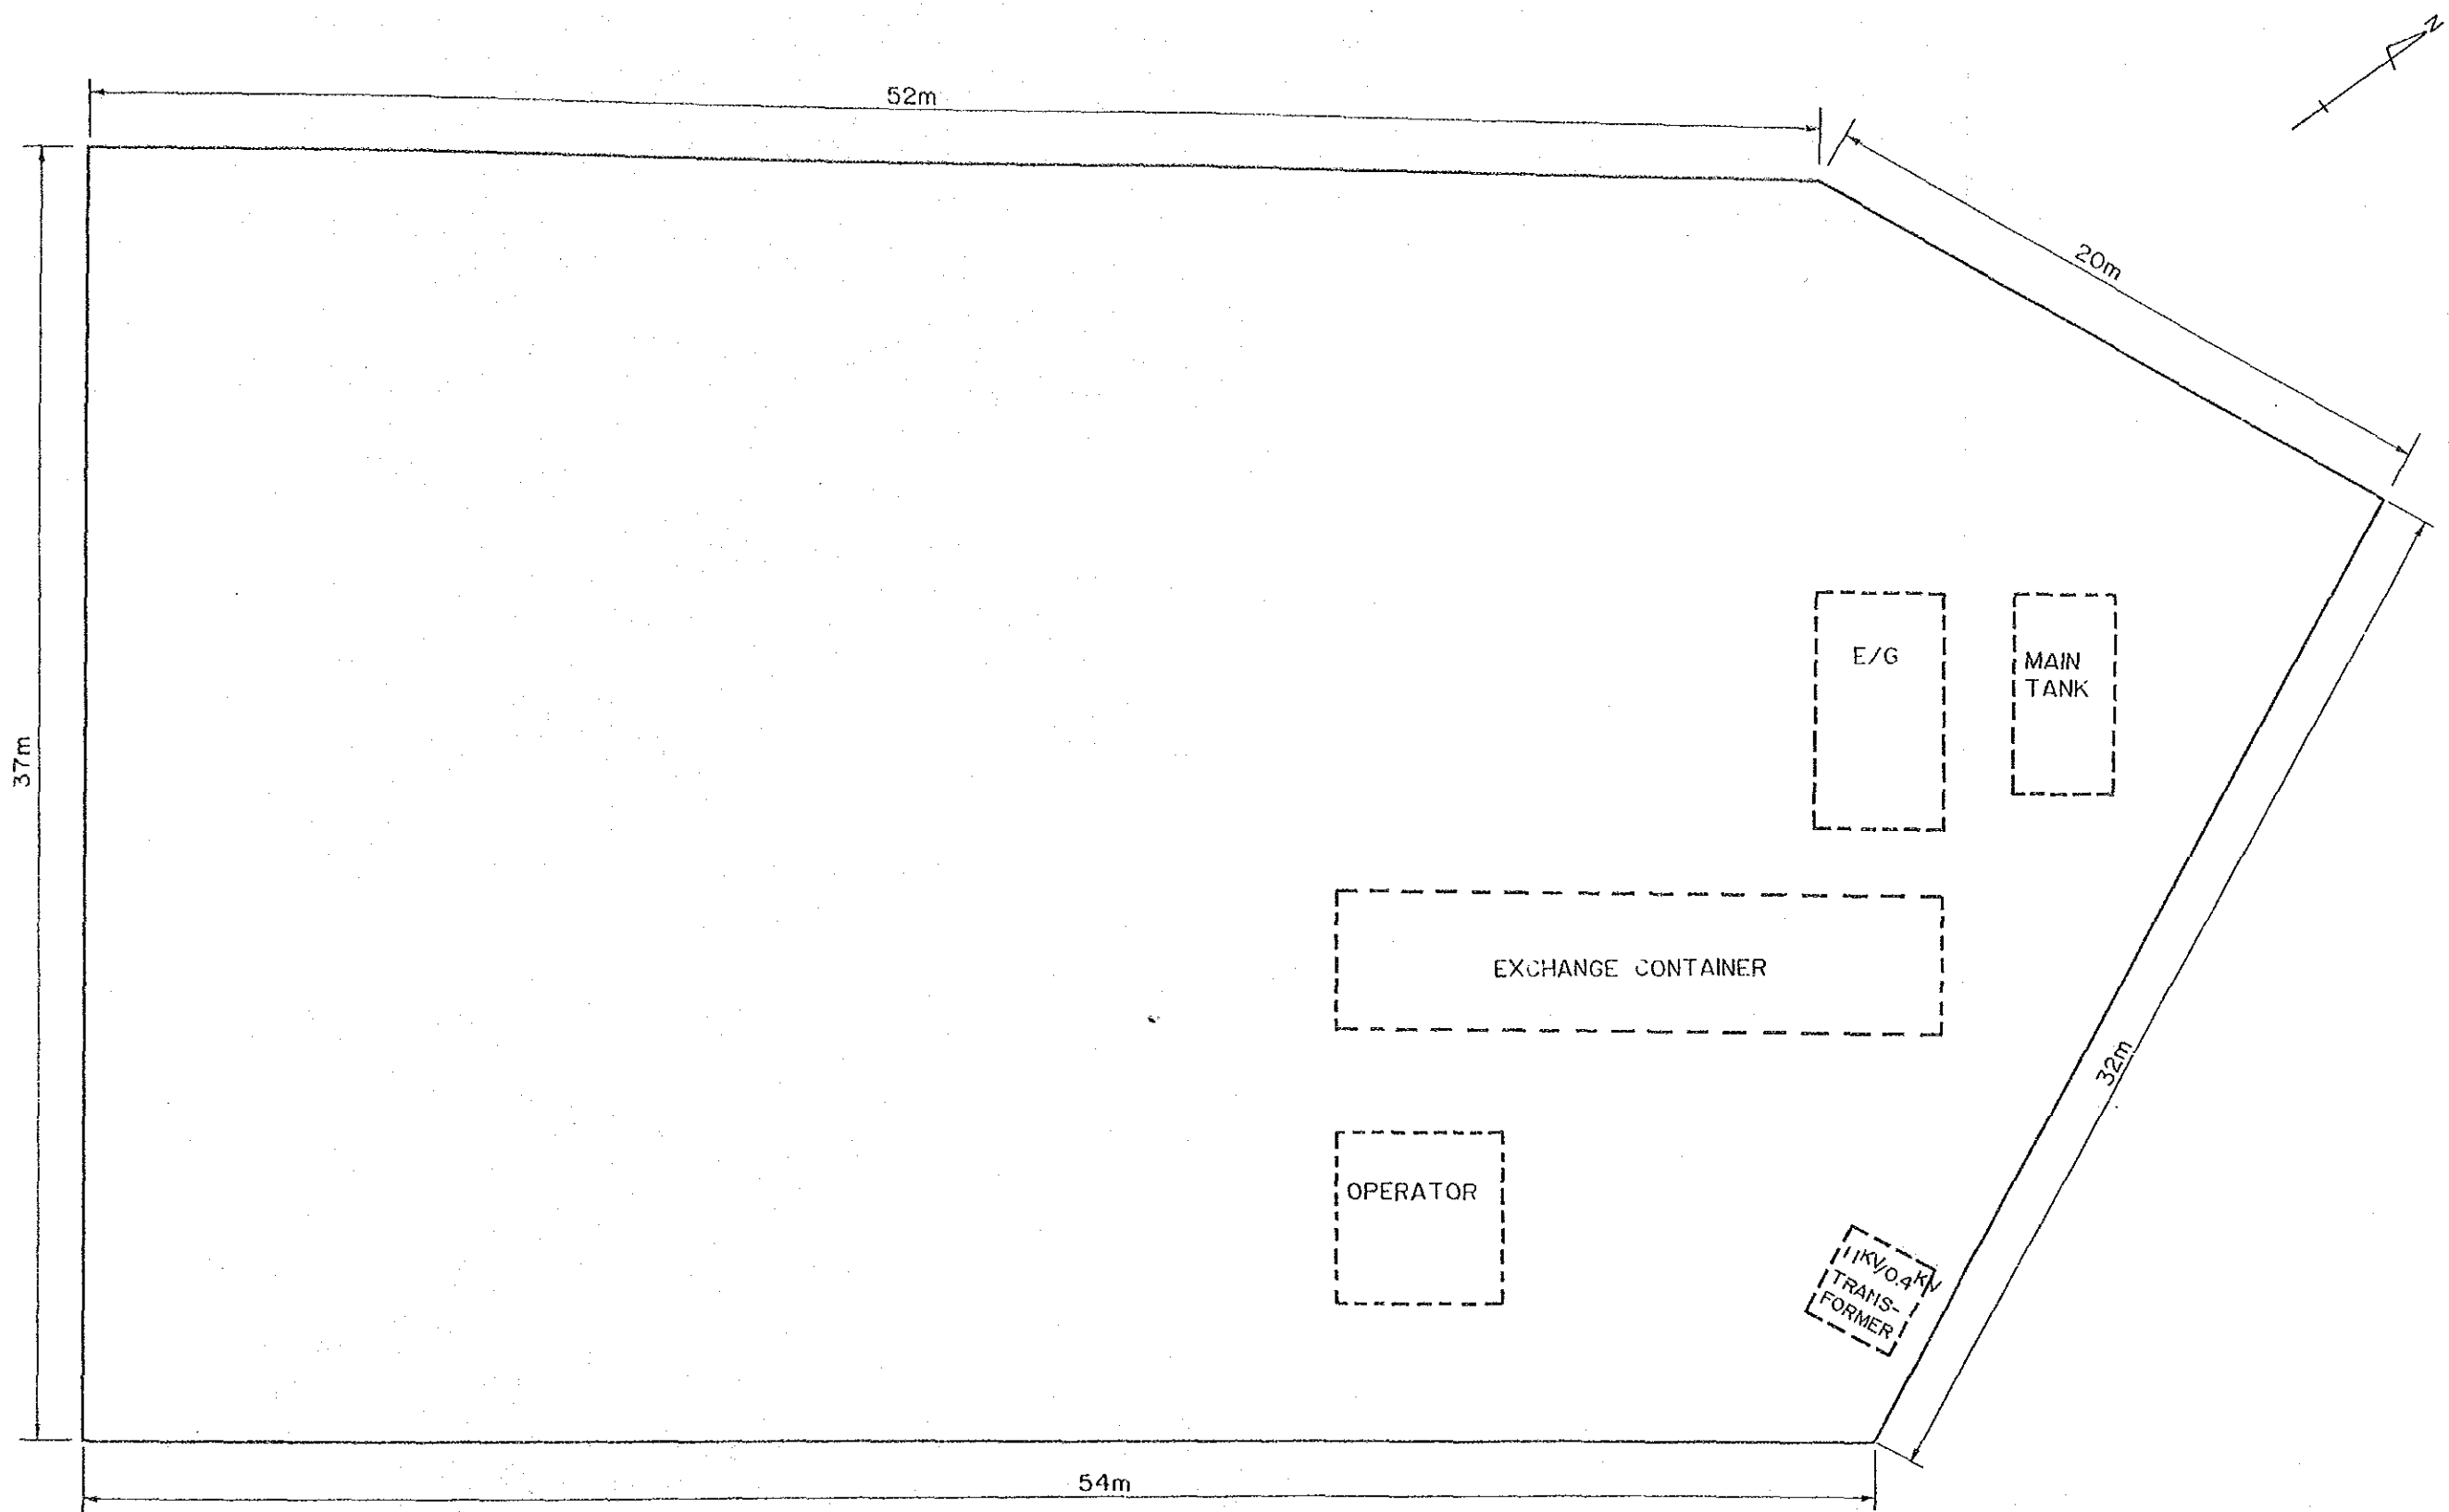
Site Layout Plan at Myaungmya New Exchange Office
